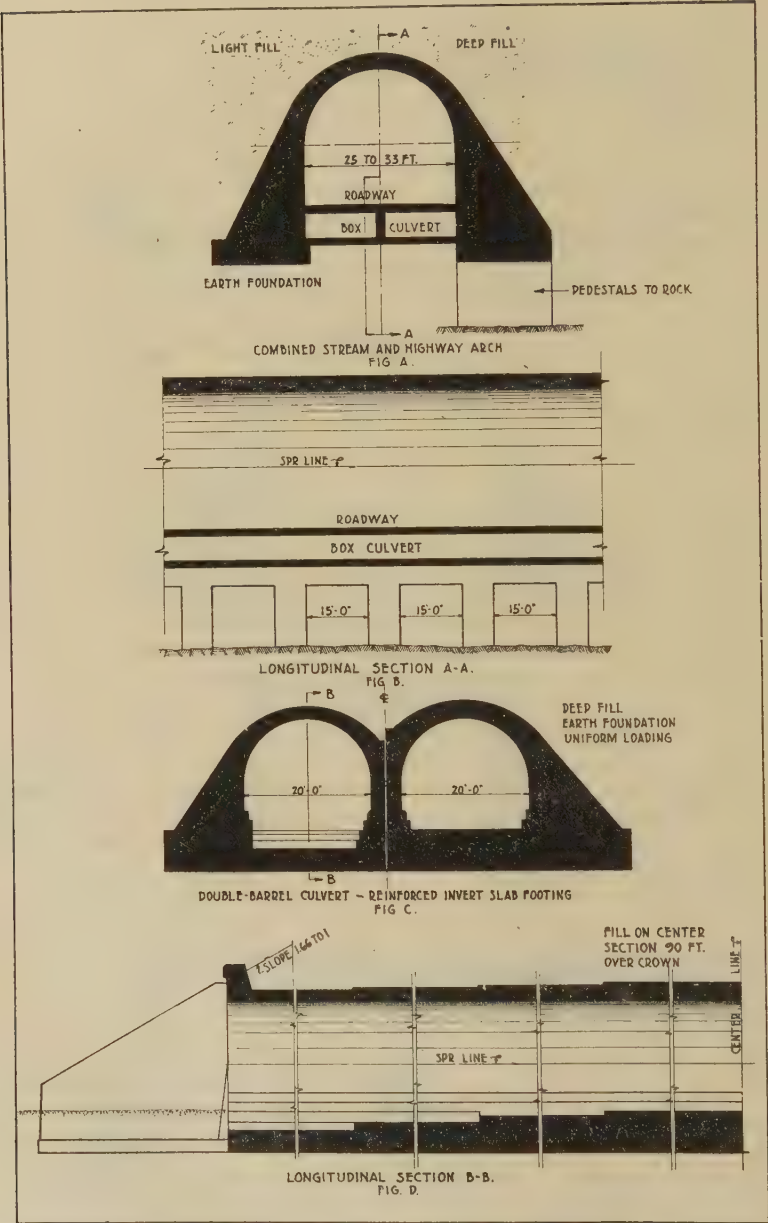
COMBINATION OF BOX CULVERT AND SEMICIRCULAR HIGHWAY ARCH.
